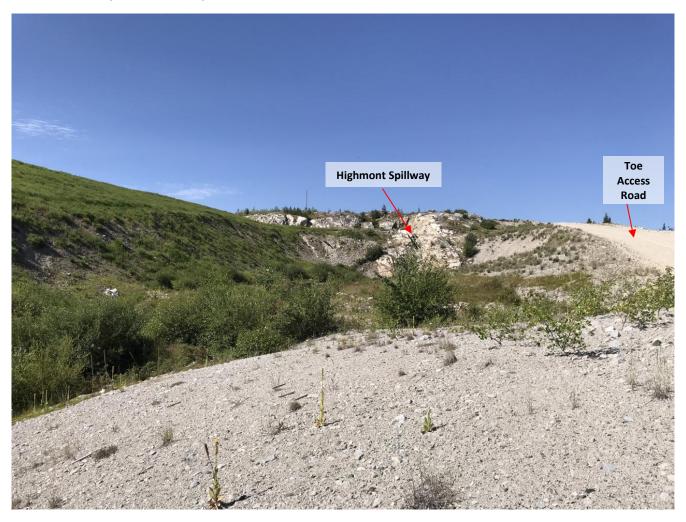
North Dam downstream slope and toe, downstream of Highmont Spillway. Water is ponded upstream of toe access road. Spillway stilling basin is heavily vegetated (HGH-2020-17)
